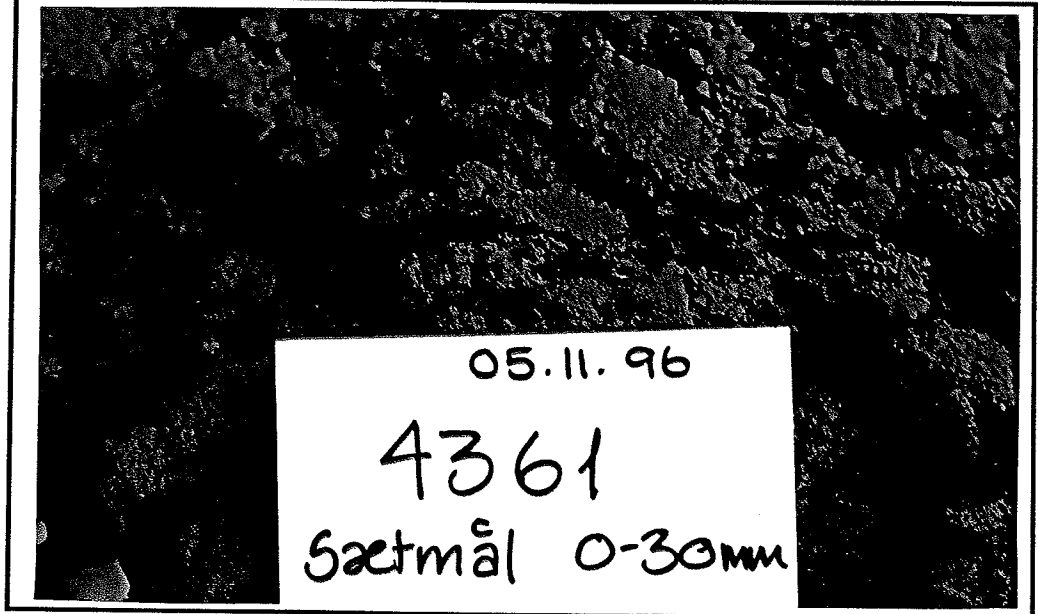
Concrete type applied at test No. 6. (F5, negative No. 16)
